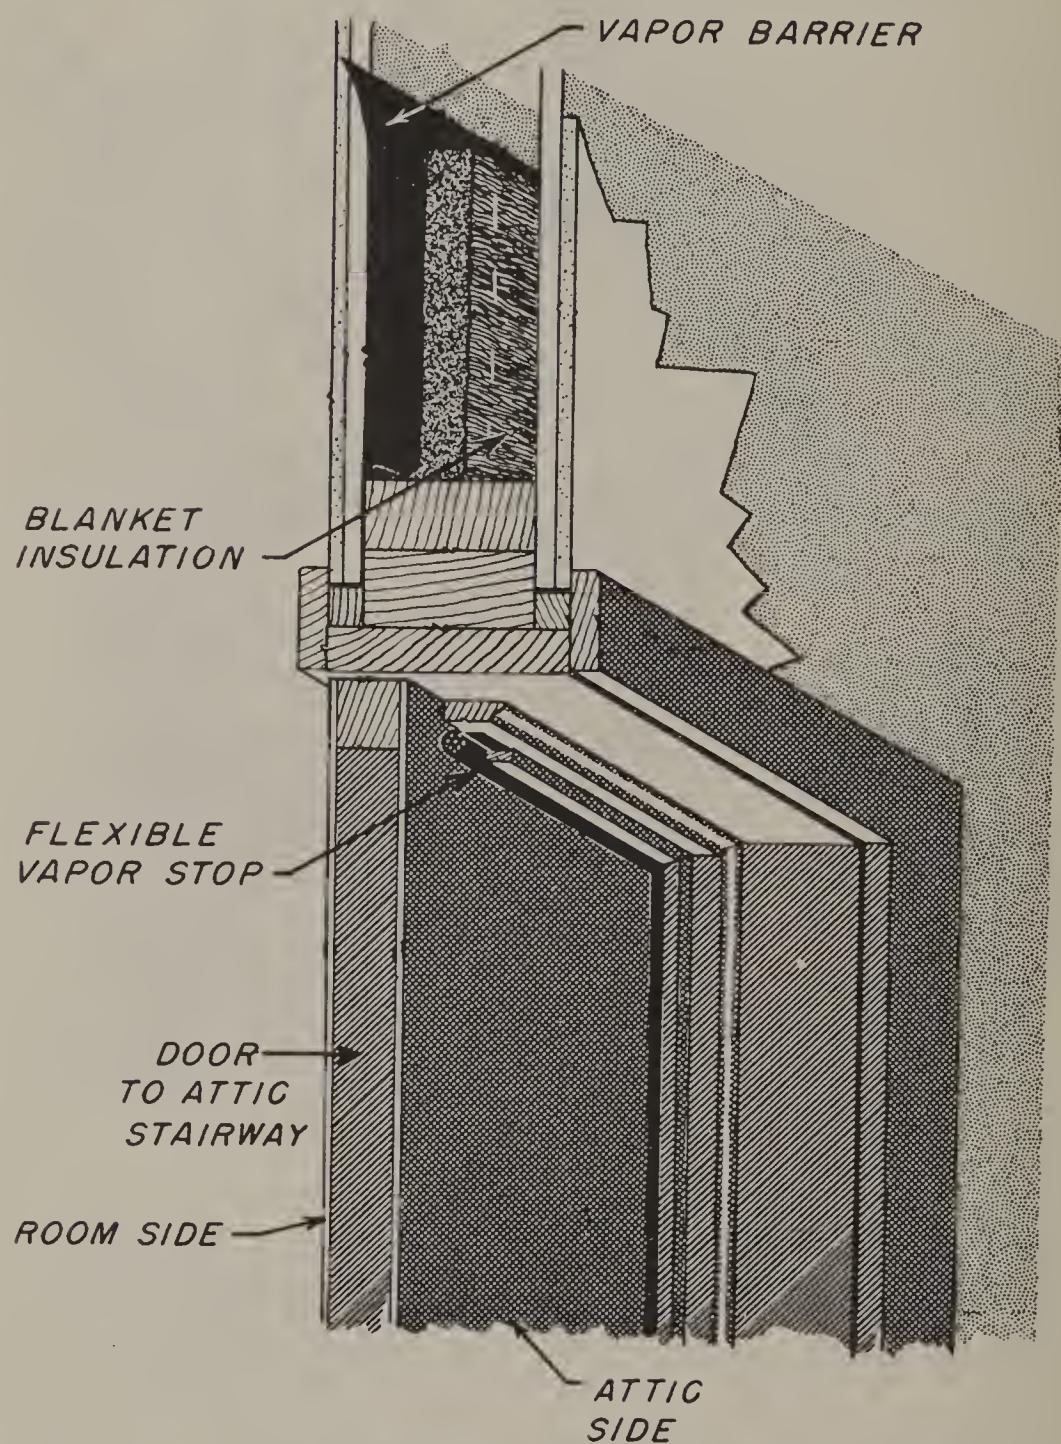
Opening into unheated attic space, detail No. 2.* Another method for making tight seals of attic doors is to attach flexible vapor stops, as shown.
